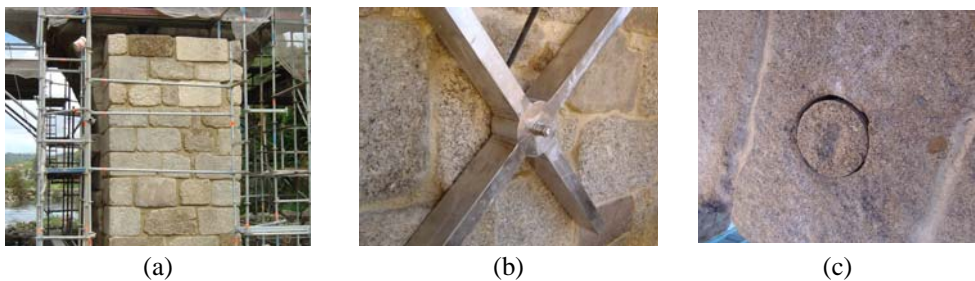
(a) Rebuilding of a downstream cutwater; (b) cross-shaped anchorage plate; (c) anchor plate covered by a stone slip.
